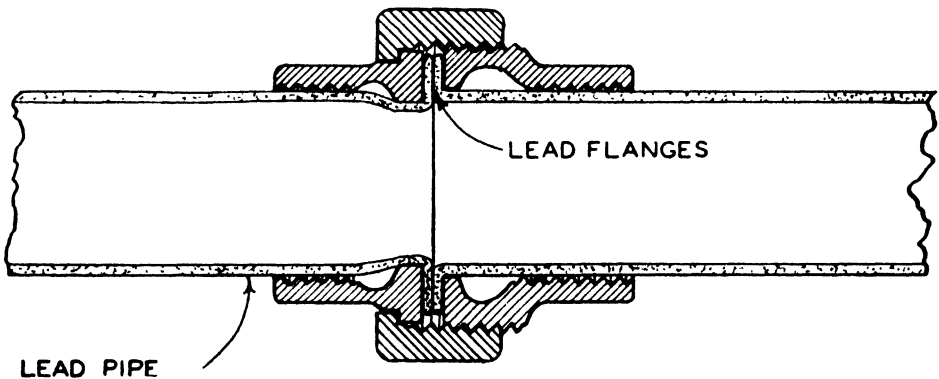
Cross-section of lead pipe joint made with a union.
